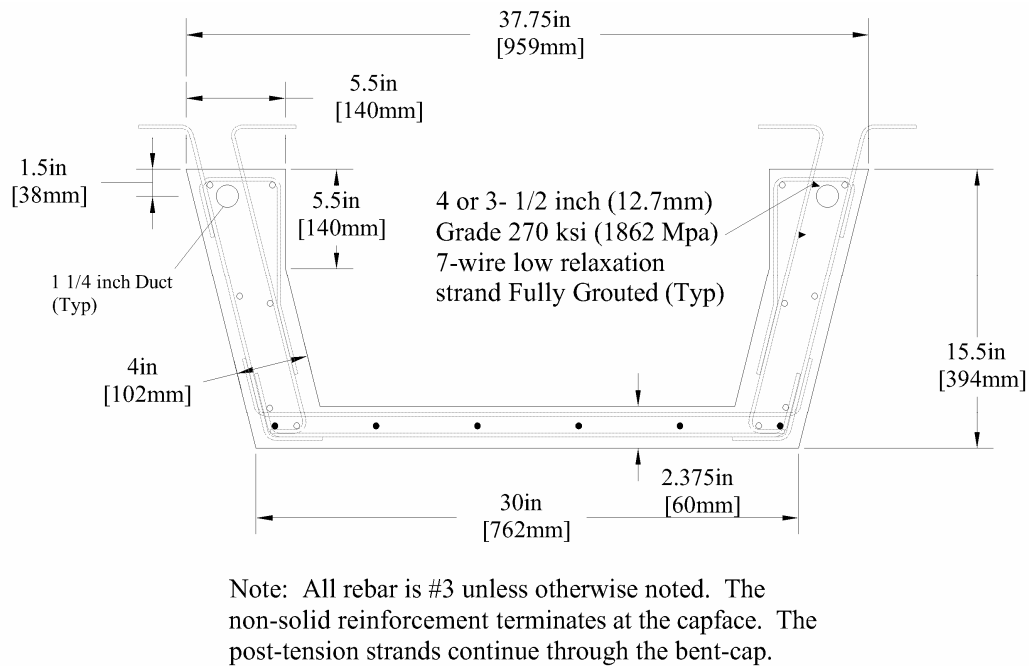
NDOT 40% Scale U-Girder Cross-Section at Girder/Bent-Cap Interface
